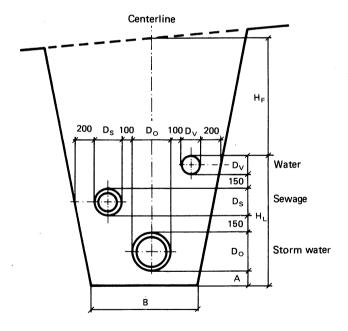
Typical arrangement of two-pipe separate sewer system in Norway.
